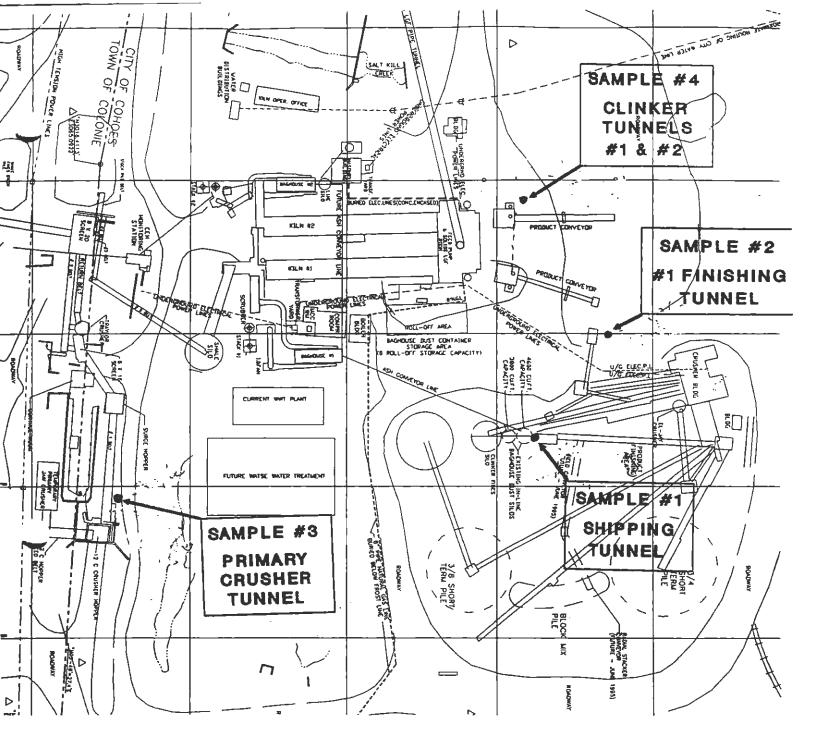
NORLITE BMP PLAN APPENDIX E
